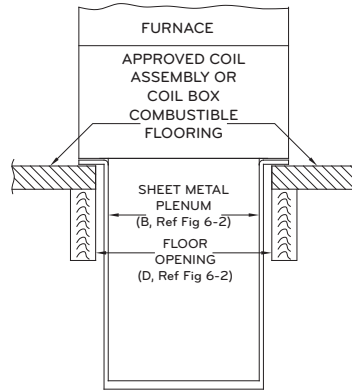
Furnace, Plenum, and Coil Assembly or Coil Box Installed on a Combustible Floor
